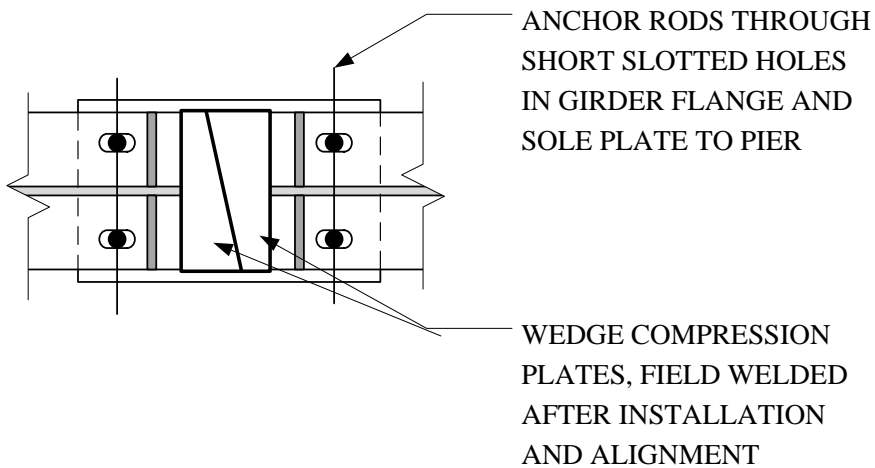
SMC Girder Support Detail 1 - Plan View
